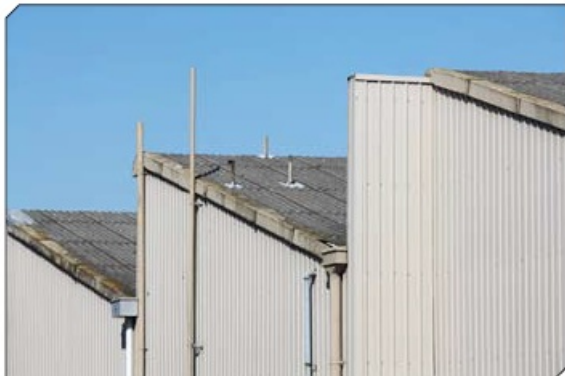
Saw-tooth design roof with corrugated asbestos cement roof sheets.
